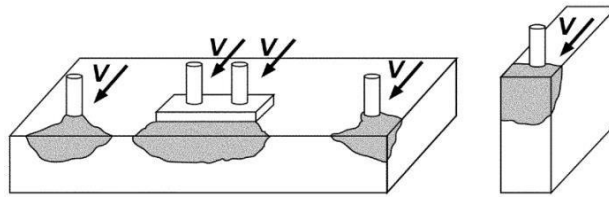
Shear Failure Type i) Steel failure preceded by concrete spall, ii) Concrete pry-out with no anchor edge reduction
